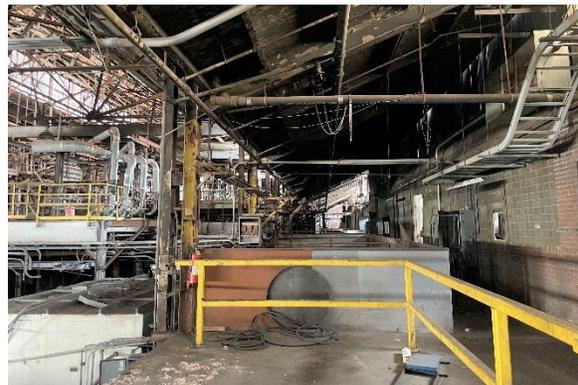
Building 8, interior of main volume, view northwest. Brick and glass block wall shared with south end of Building 9 is at right.
